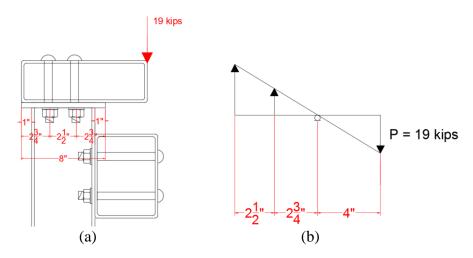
Top Rail Fully-Welded Plate Final Design - (a) Profile View, (b) and Linear Loading Distribution
